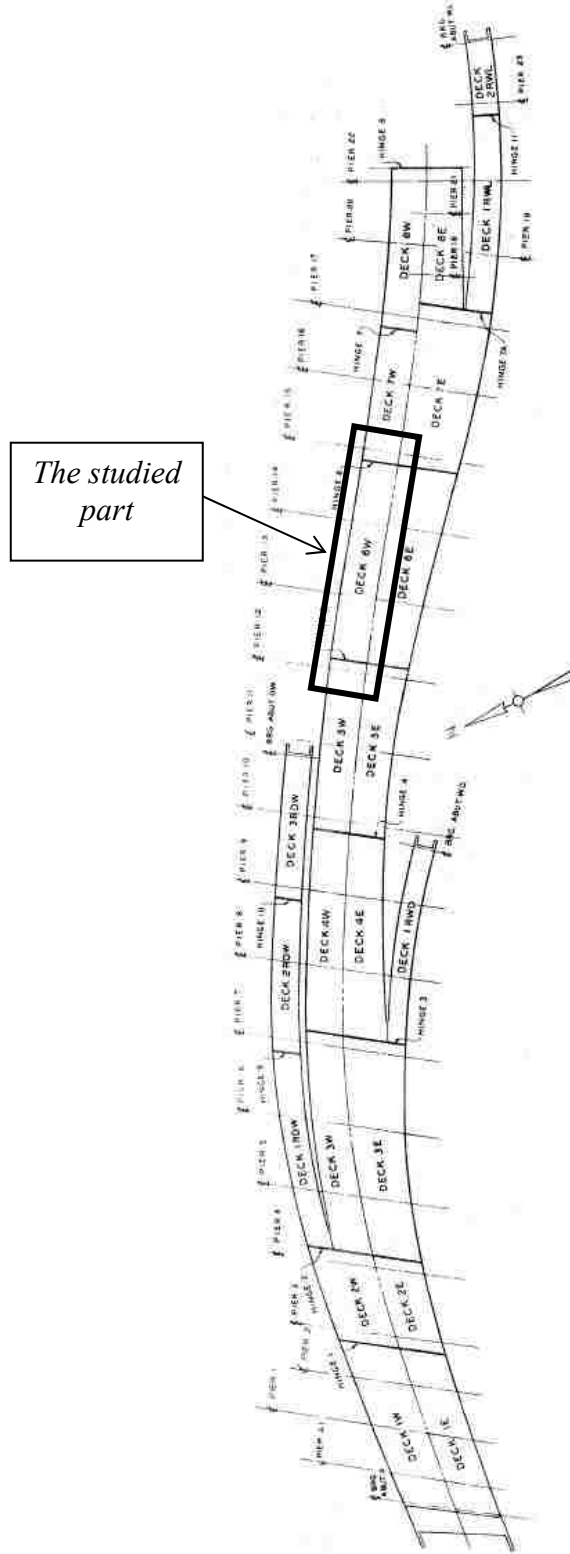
Bridge G-947 - Layout and the location of the studied part
